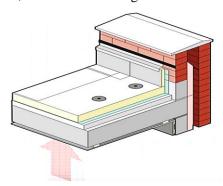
Horizontal separating elements (recreated from Kingspan Insulation UK, 2020)
